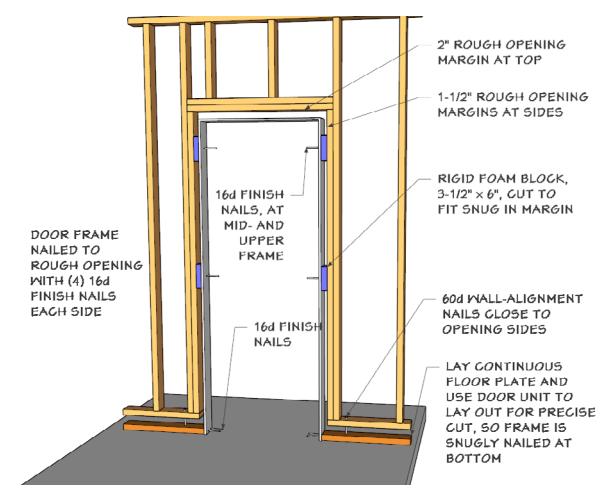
Door frame set in floating wall. (Twinsprings Research Institute, 2016).
